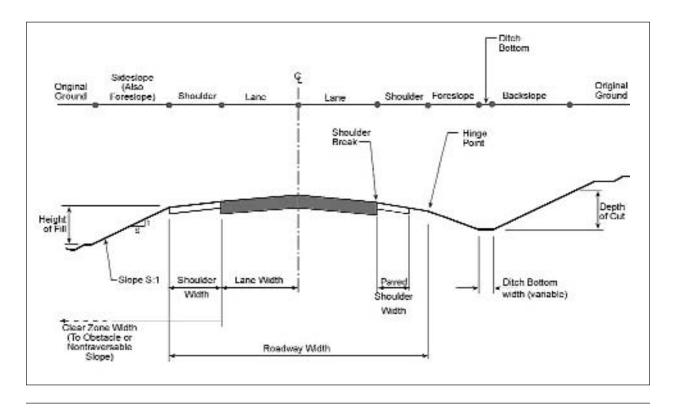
Major Elements of Rural Highway Cross Sections
